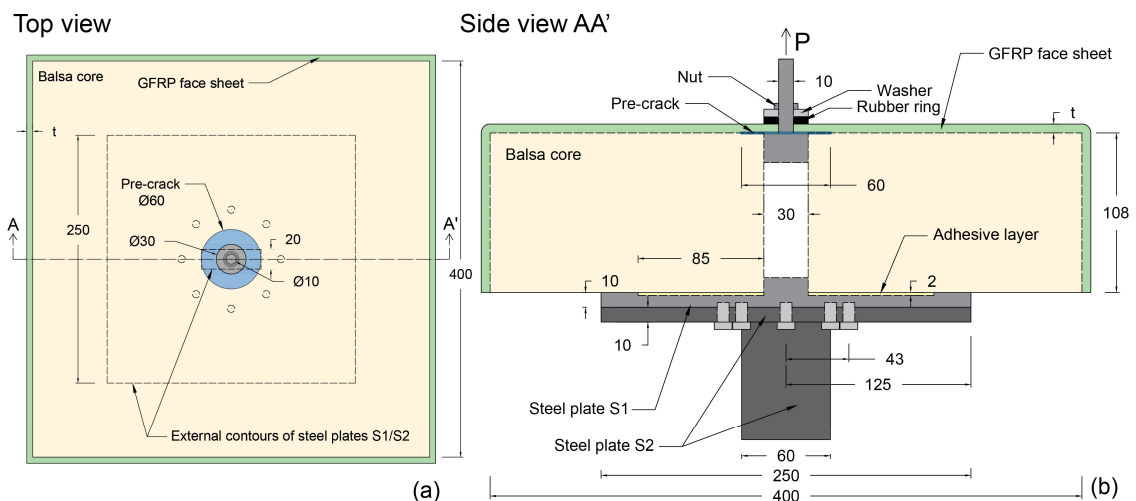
Sandwich panel layout; (a) Top view and (b) Side view of section AA' in (a). Dimensions in mm
